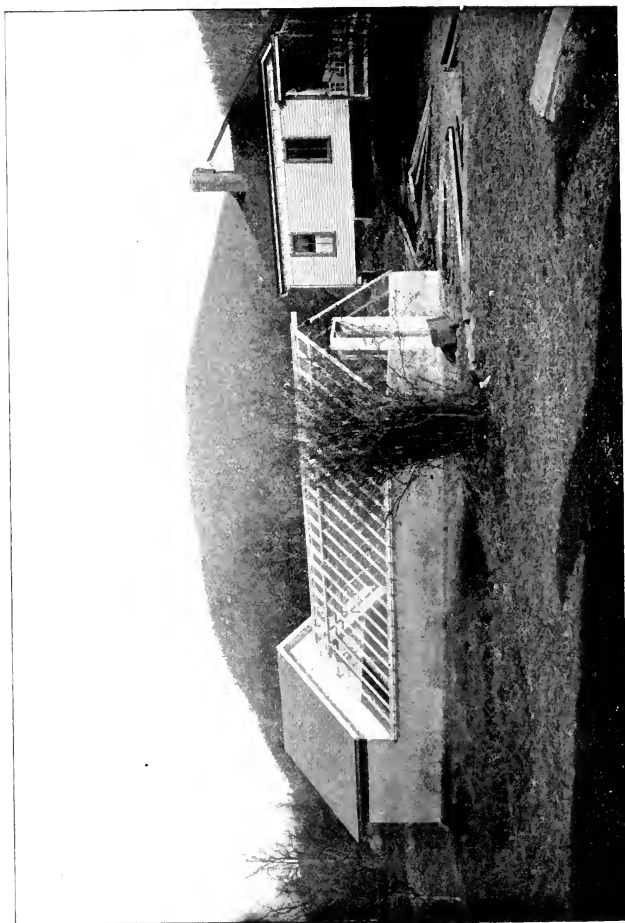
CONCRETE HOTHOUSE AT BERKSHIRE INDUSTRIAL FARM, CANAAN, N. Y.
